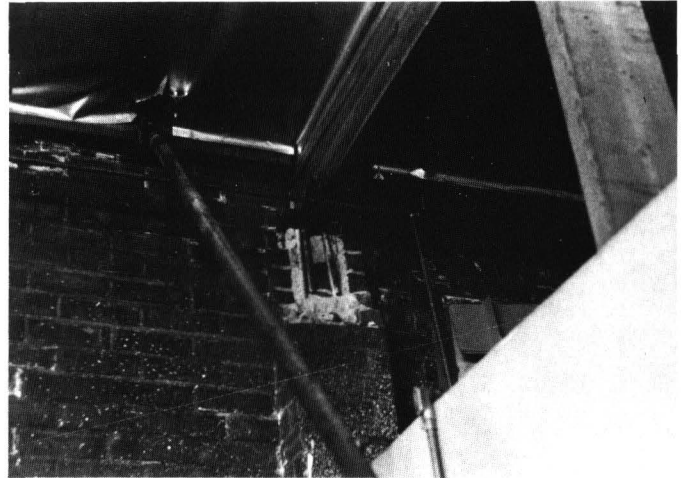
12836 West Arroyo. Damaged pilaster. J. F. Meehan, OAC photograph.
